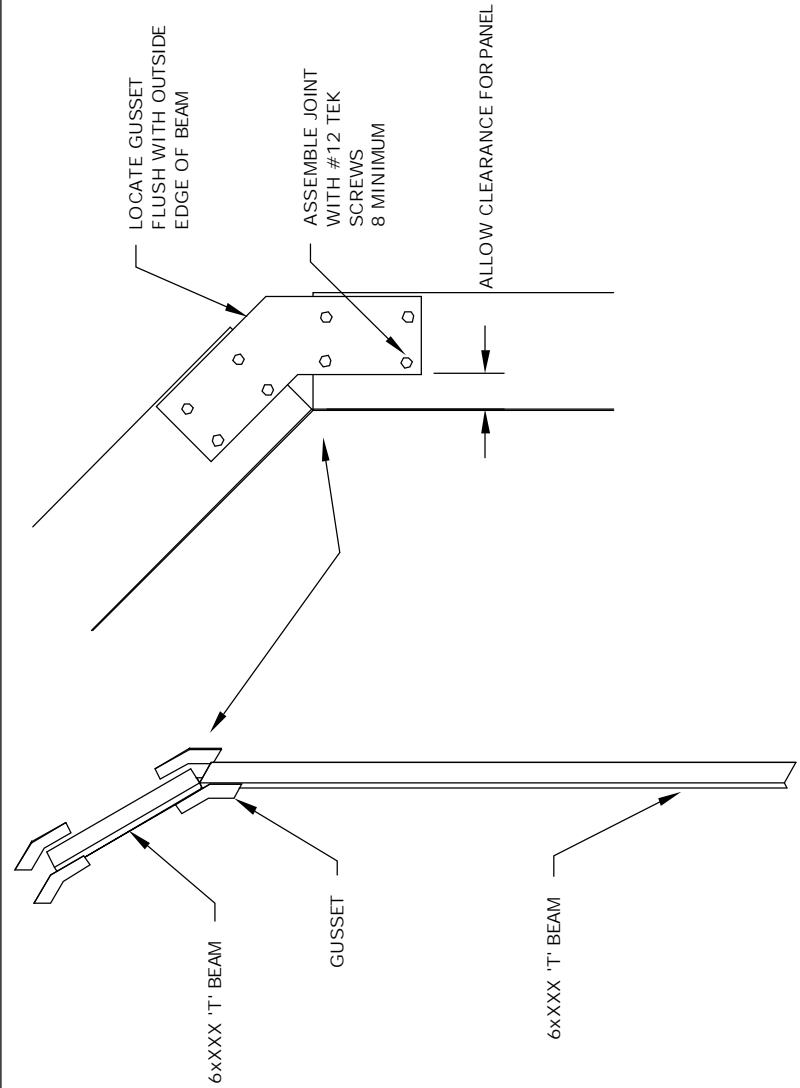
ASSEMBLY OF 'T' BEAM SECTIONS
